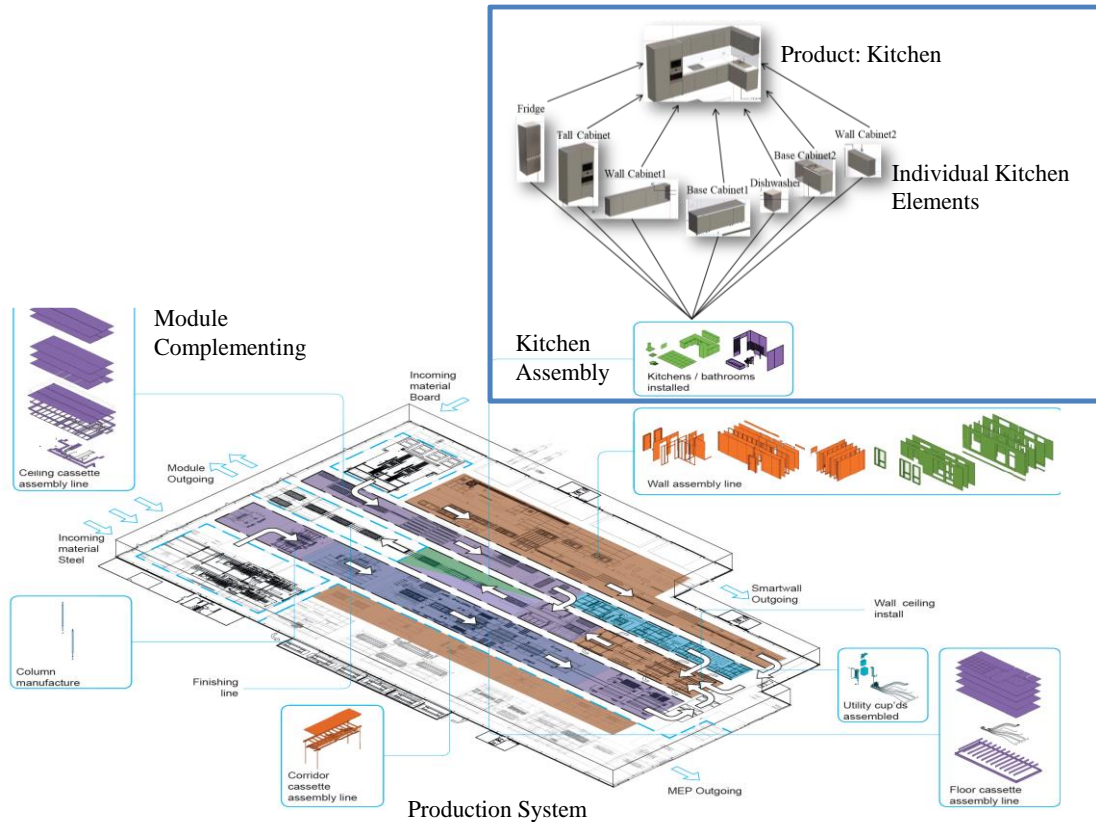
Proposed layout of the new advanced manufacturing facility, with the kitchen assembly on the finishing line in the rectangle (adapted from Bryden Wood 2015)
